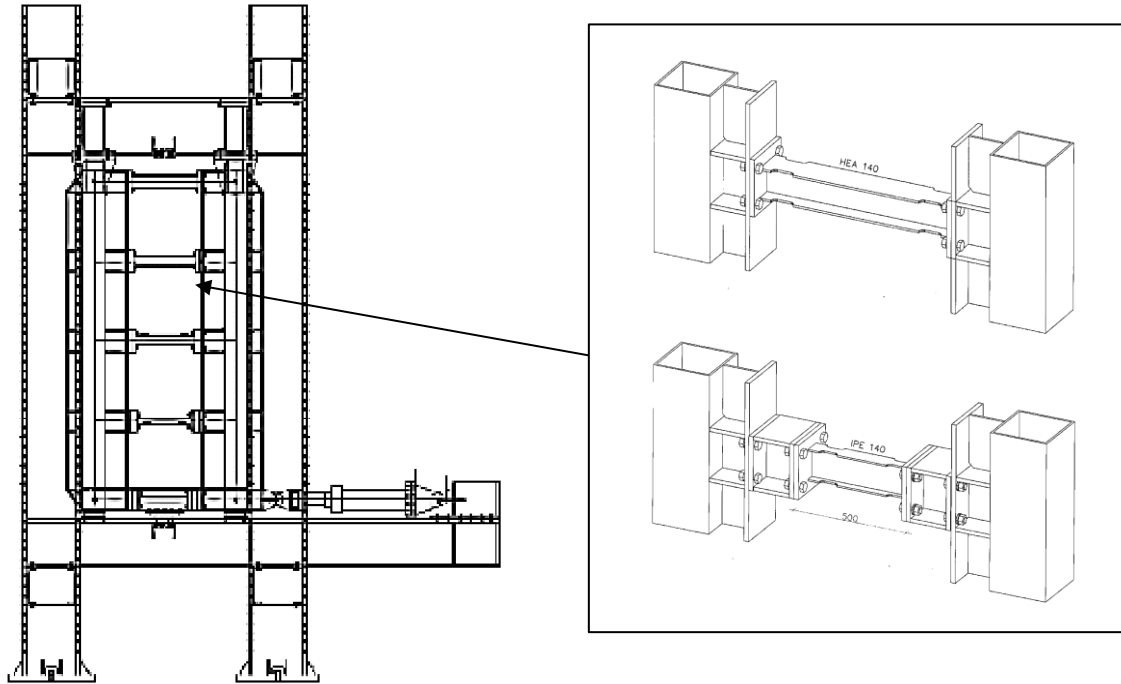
Side view on test frame with five individual beam links (left) and attachment details of individual beam links to strong columns (right)
